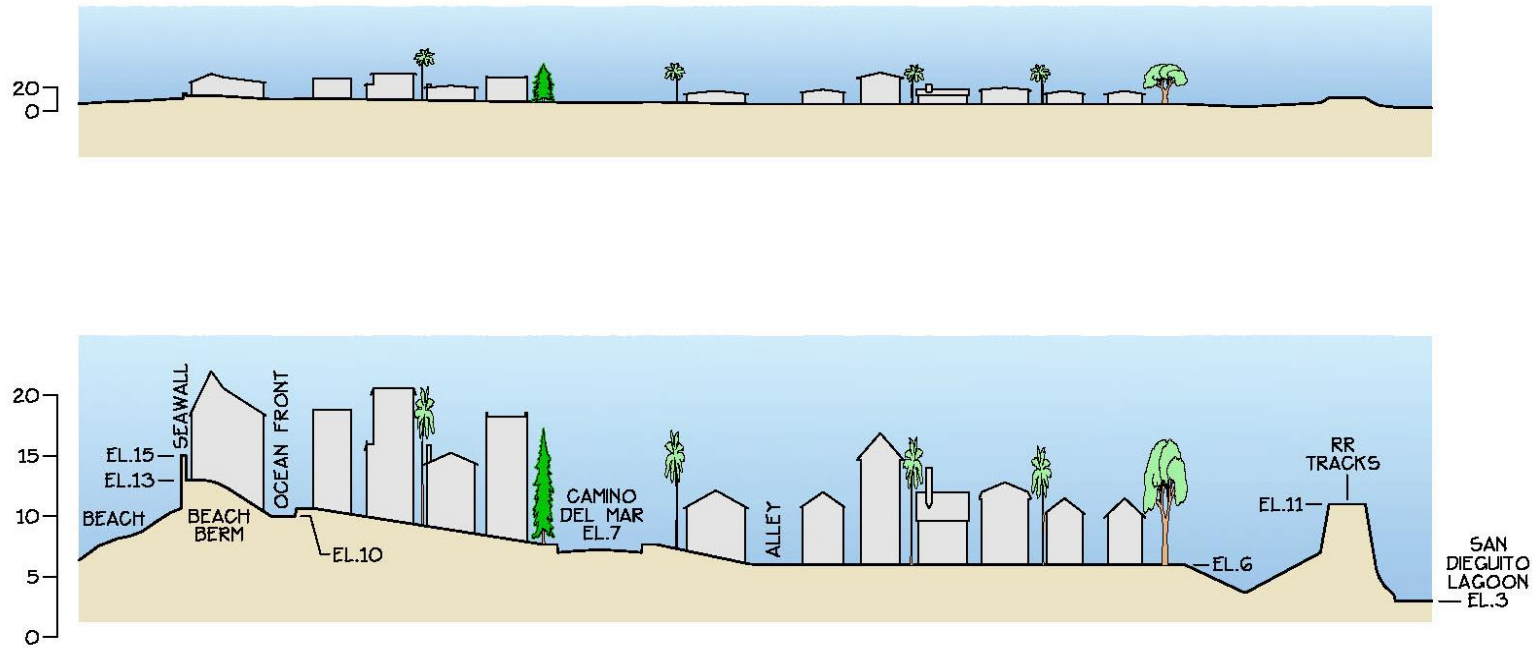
Typical seawall protecting the seaward-most row of North Beach homes, with a top-of-wall elevation of +15 feet
